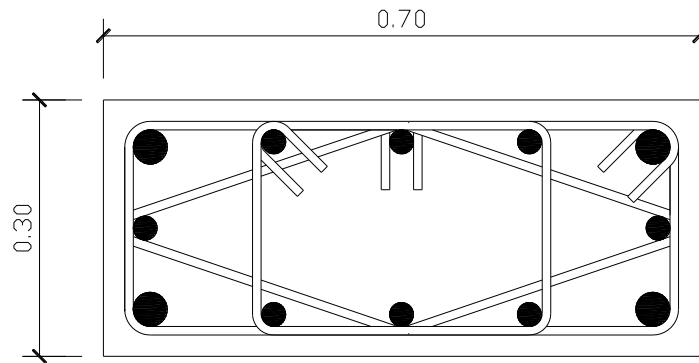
Cross-section of columns C1 to C6 and C11 to C16 (longitudinal reinforcement 4Φ16 & 8Φ14)
